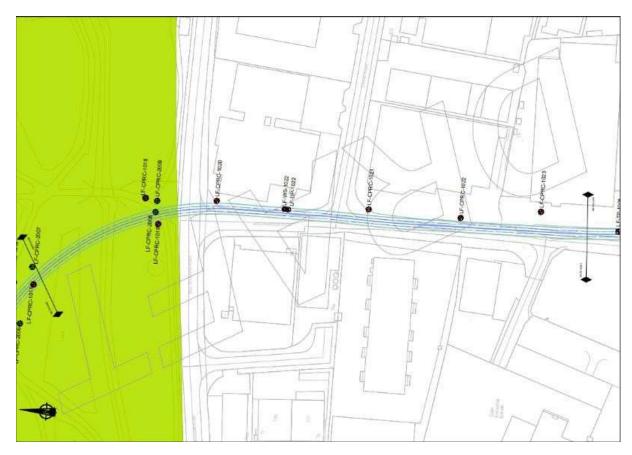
GI Plan Sheet 2, Luas Finglas (Barry Transportation and Eegis).
